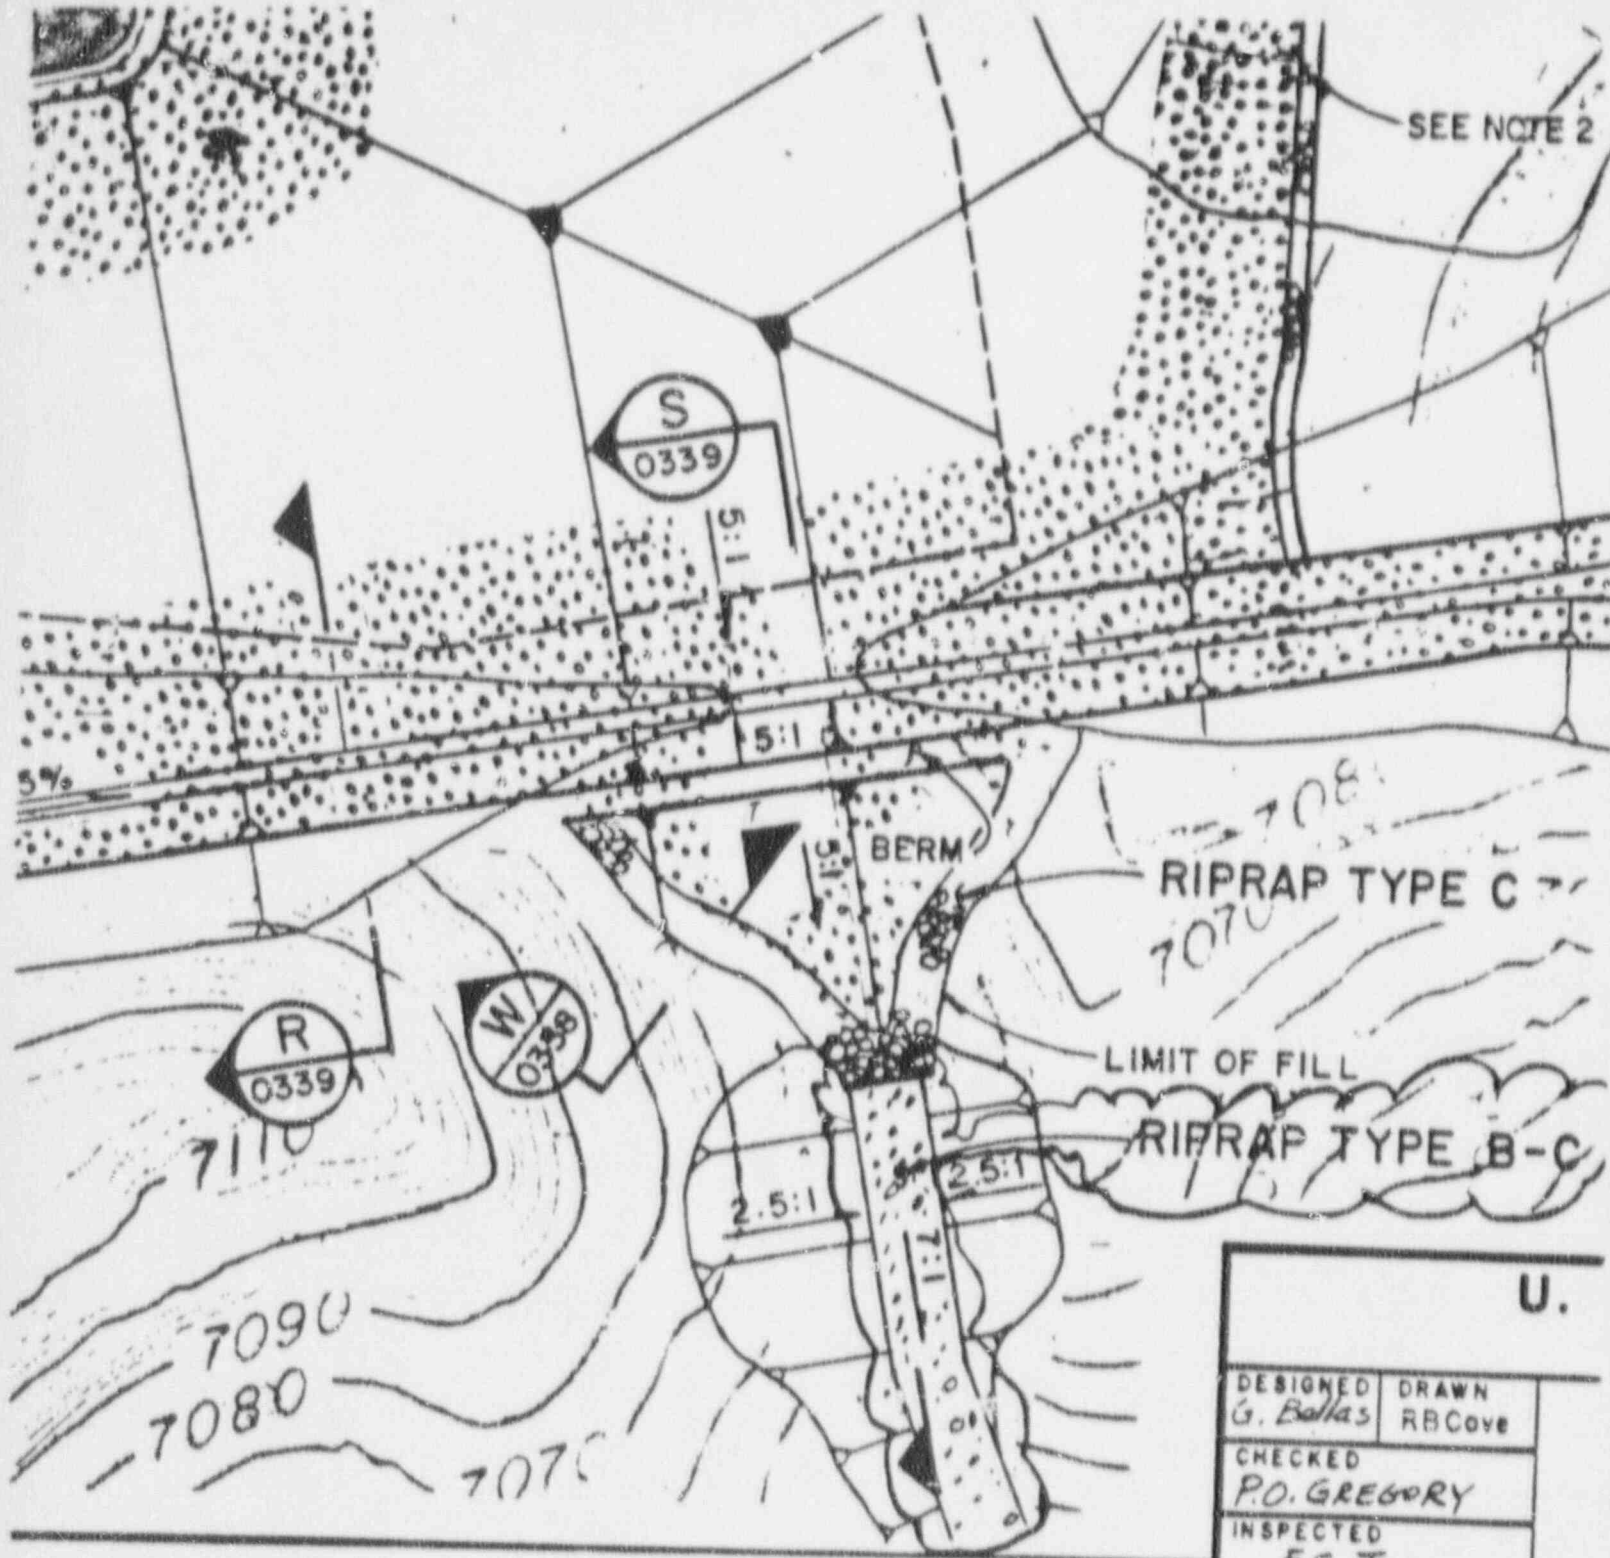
ADDITION OF RIPRAP B-C TO BERM OUTLET
